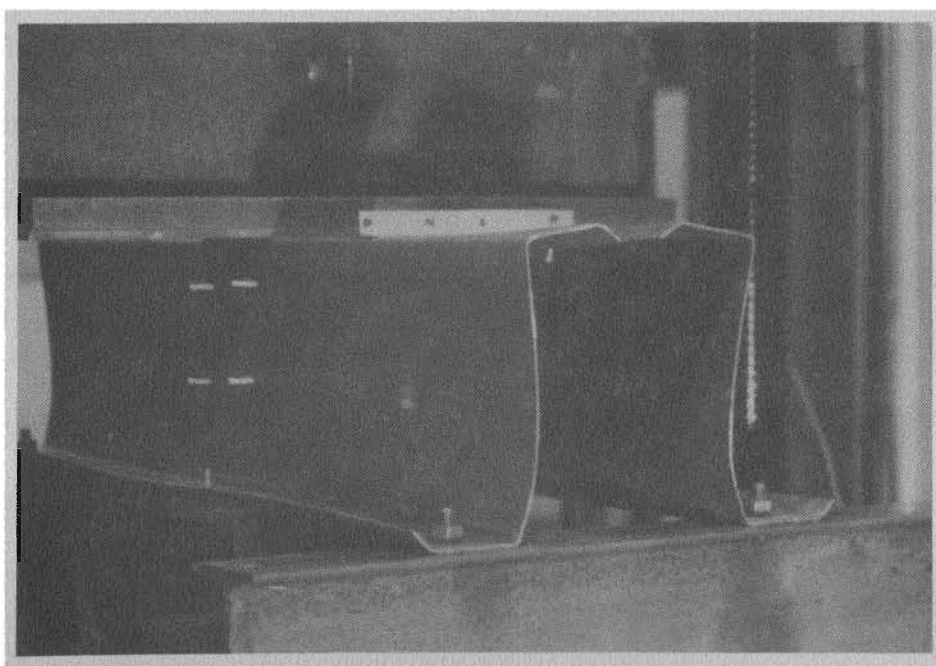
Photograph of Typical Failure of a Z-Section with Cross-Bracing Subjected to EOF Loading Condition with Unrestrained Flanges
